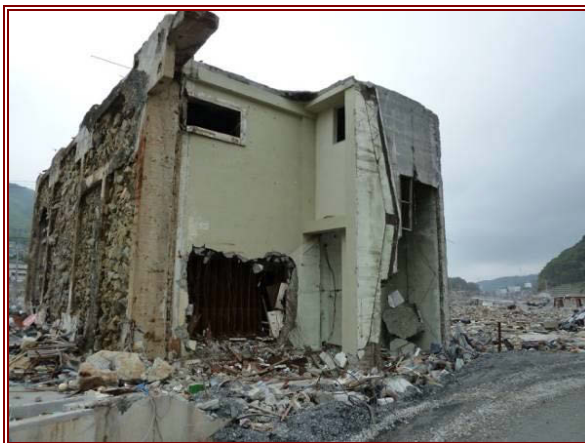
(left) View of building E showing out-of-plane failure of an infill wall.
